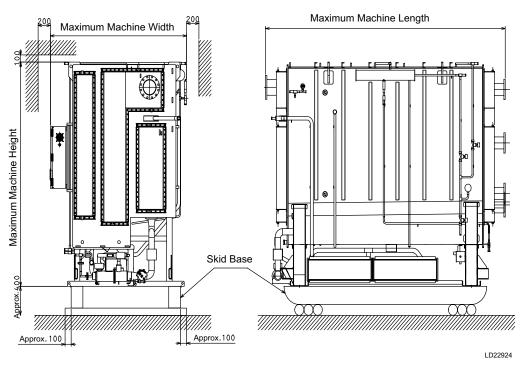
MOVING THE MACHINE ON ROLLERS
